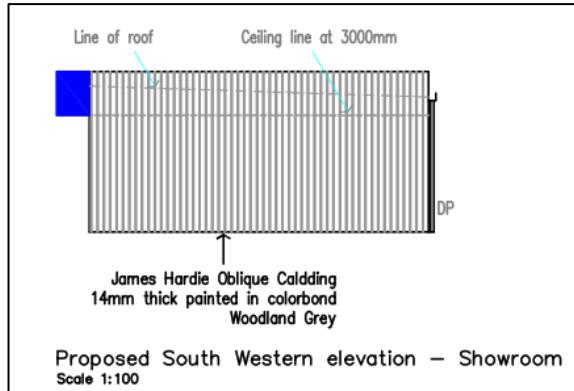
South-western elevation of sales building (Source: Badaoui Group, 2025)
